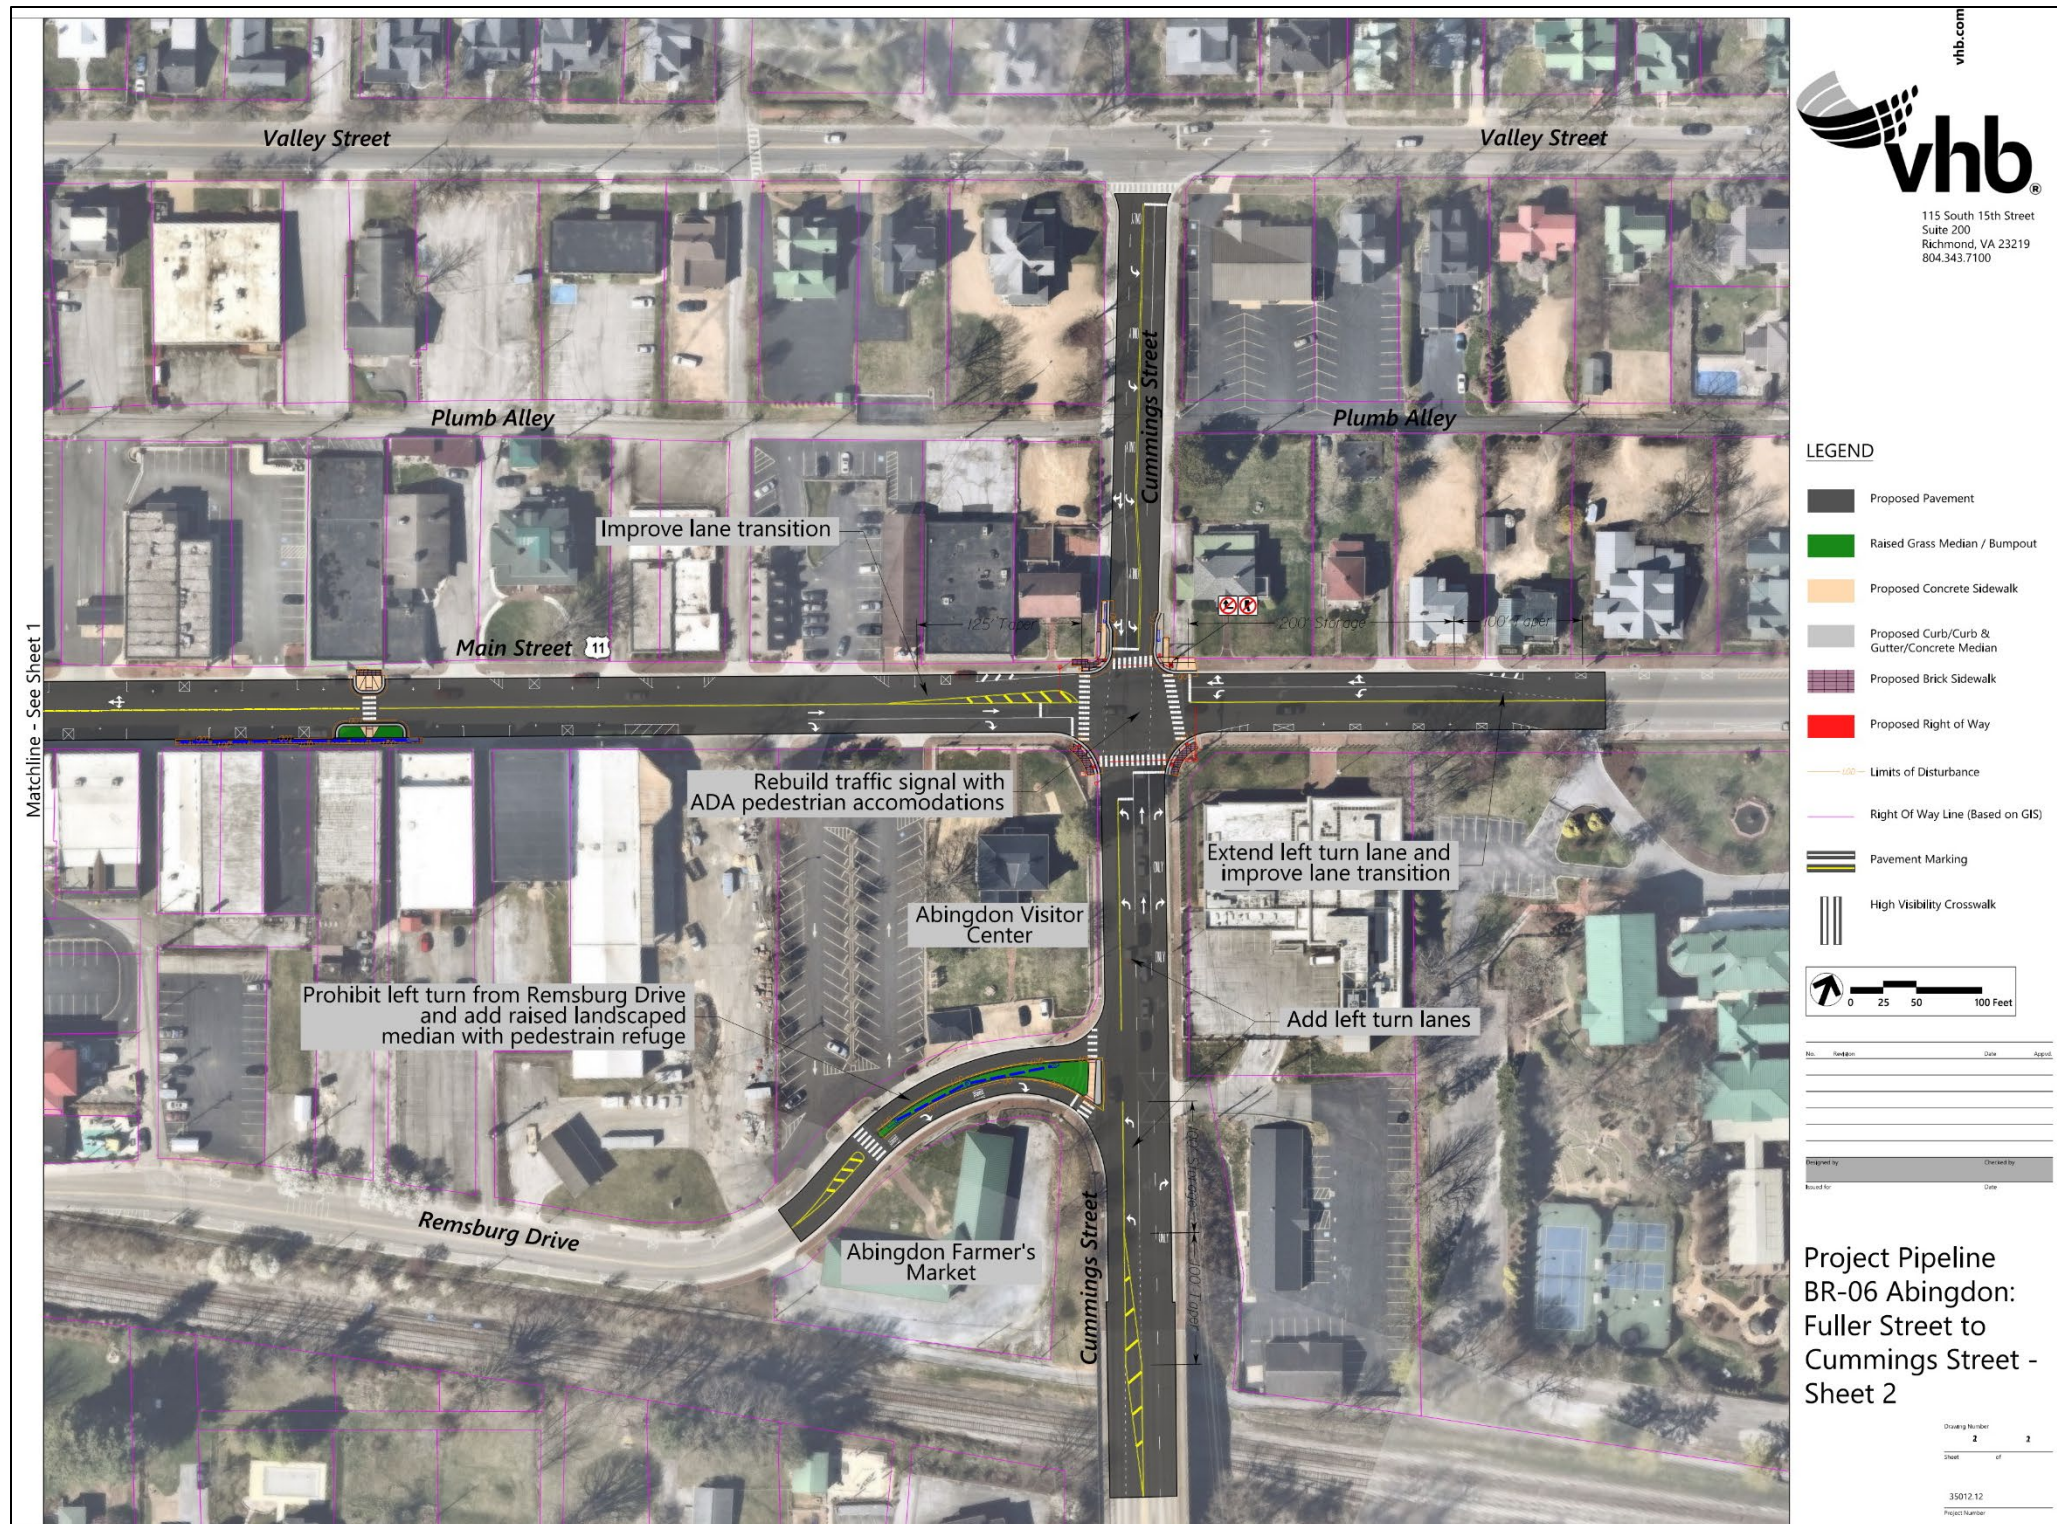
Fuller Street to Cummings Street Improvements - Sheet 2
